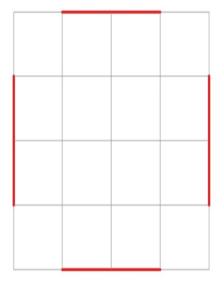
(a) Structural Plan for X-braced RC Frame (Model-3)
